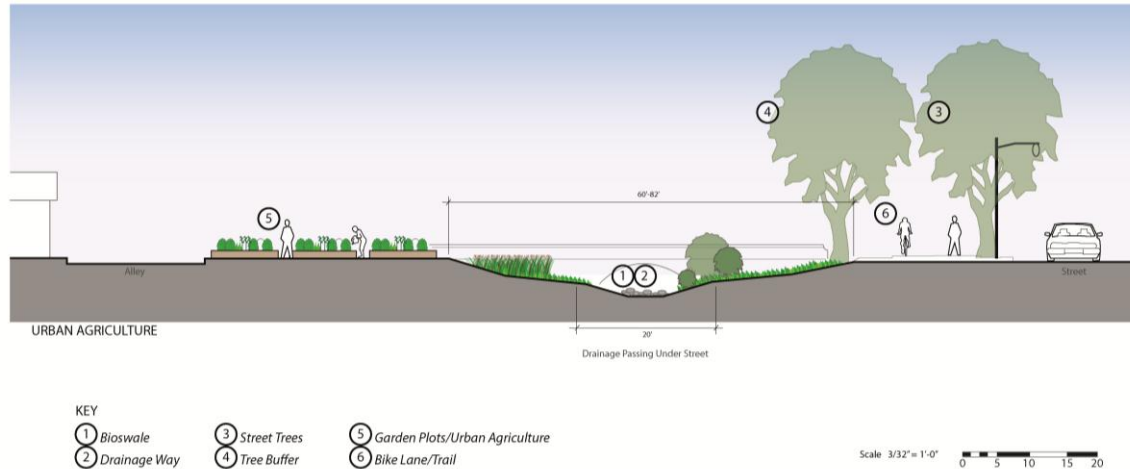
Conceptual Greenway Corridor Cross Section View on W. Clark Street from N. 30th Street to N. 27th Street
